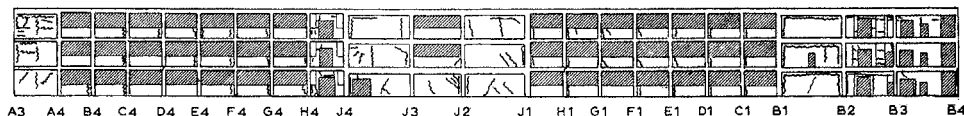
Differential Settlement at Each Column of Building (Fjeld, 1963)
